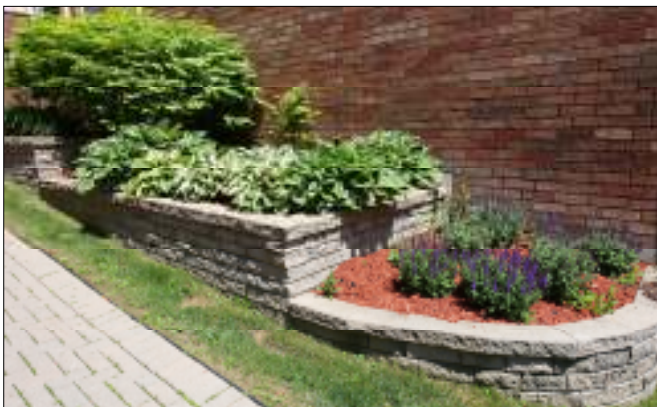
Landscape retaining walls should not be higher than 0.6 m
